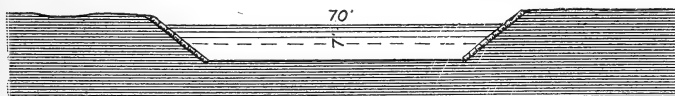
Earth section of enlargement of Erie canal of 1862. Width of bottom of canal 52 feet.
